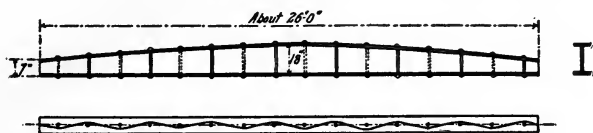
Early Form of Wrought-iron Girders, used in Sedgwick Hall, Lenox, Mass.
